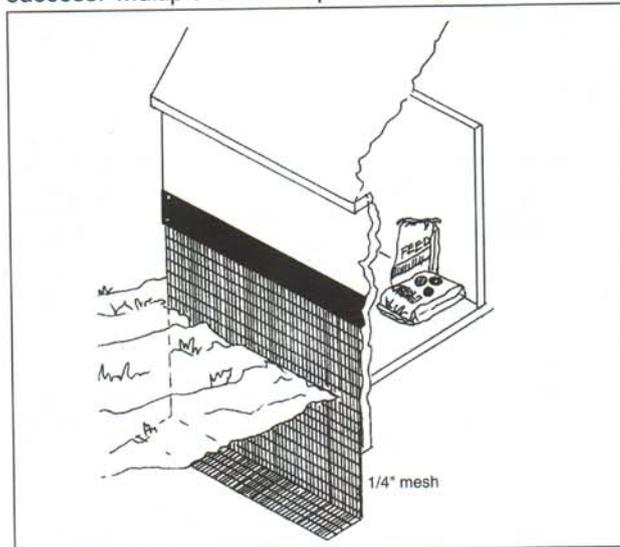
A curtain wall of hardware cloth can prevent rats from burrowing under concrete slabs or foundation walls.
